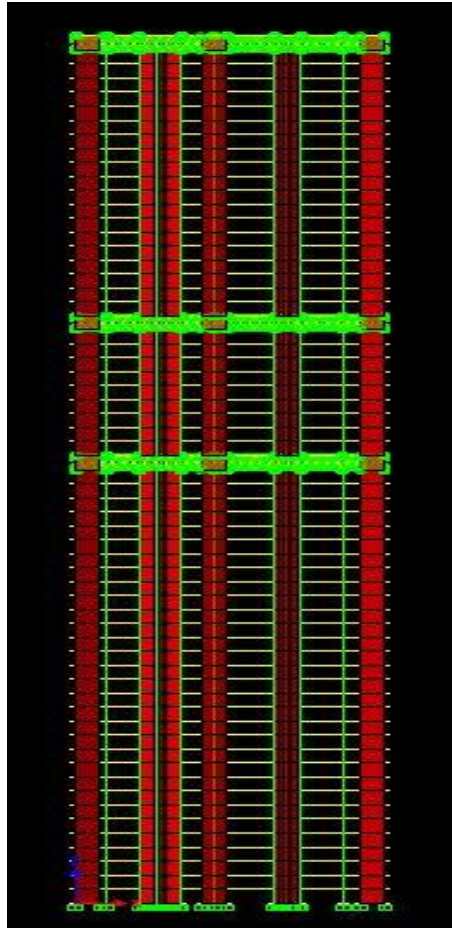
Elevation (Model No 6- OUTRIGGER AT Top, Mid & Two third Height)
